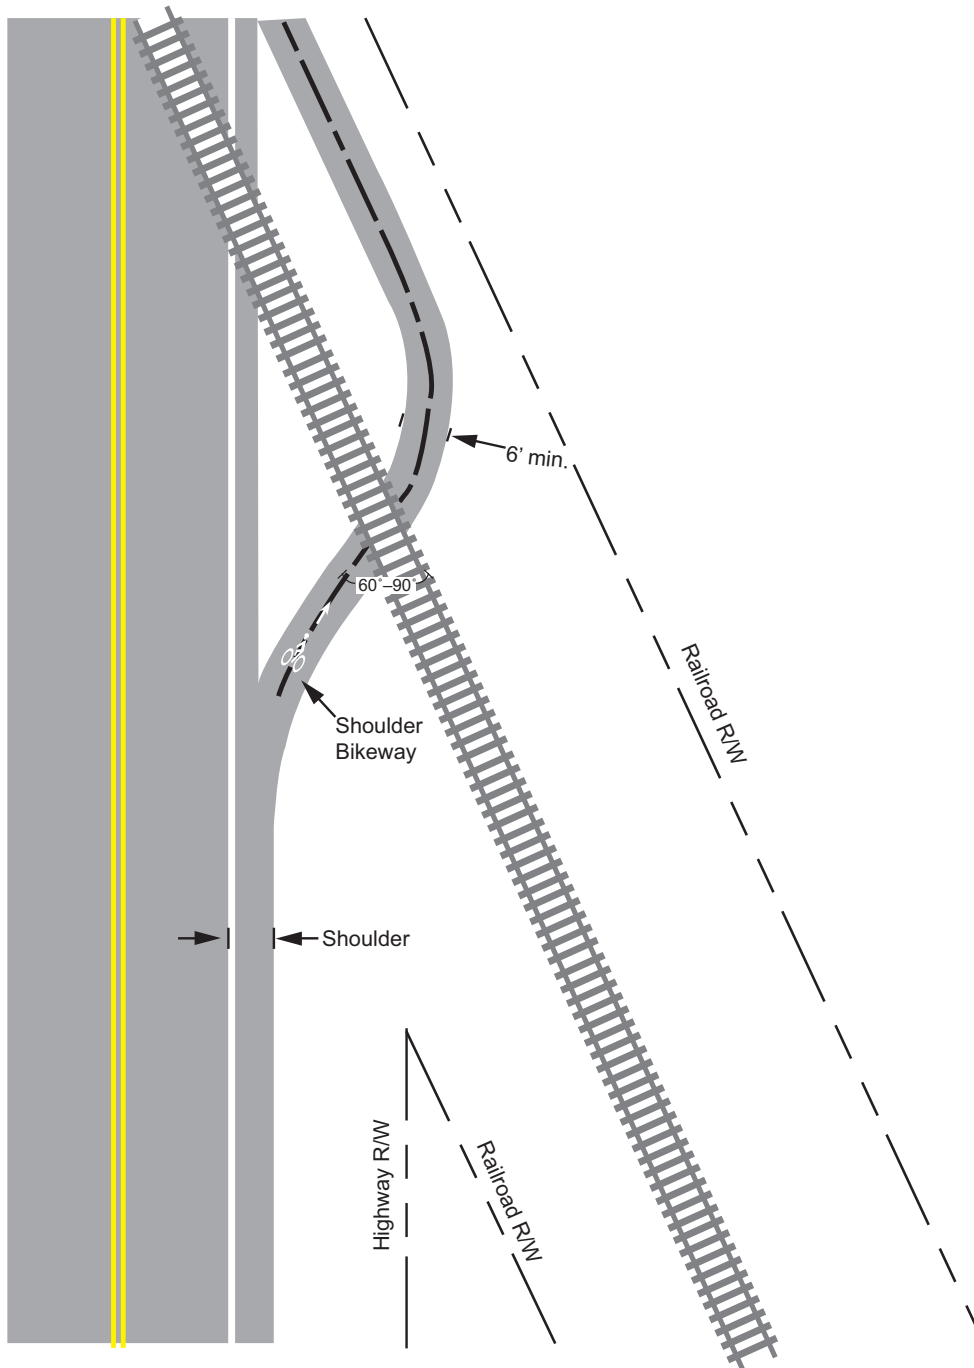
Correction for Skewed Railroad Grade Crossing—Separate Pathway
